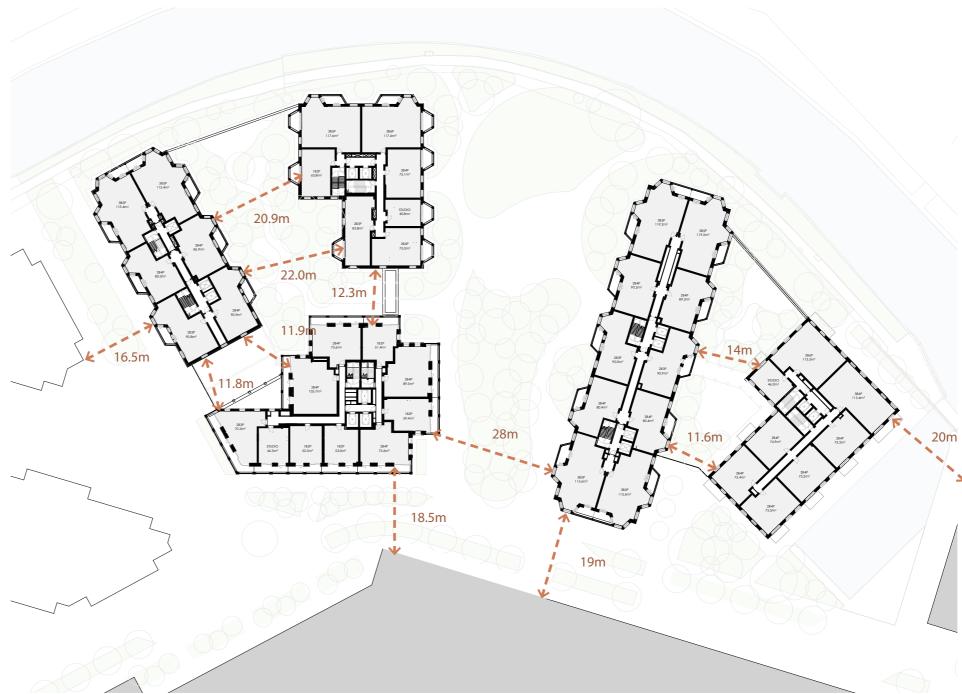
Plan showing distances between buildings (Illustrative Scheme)
